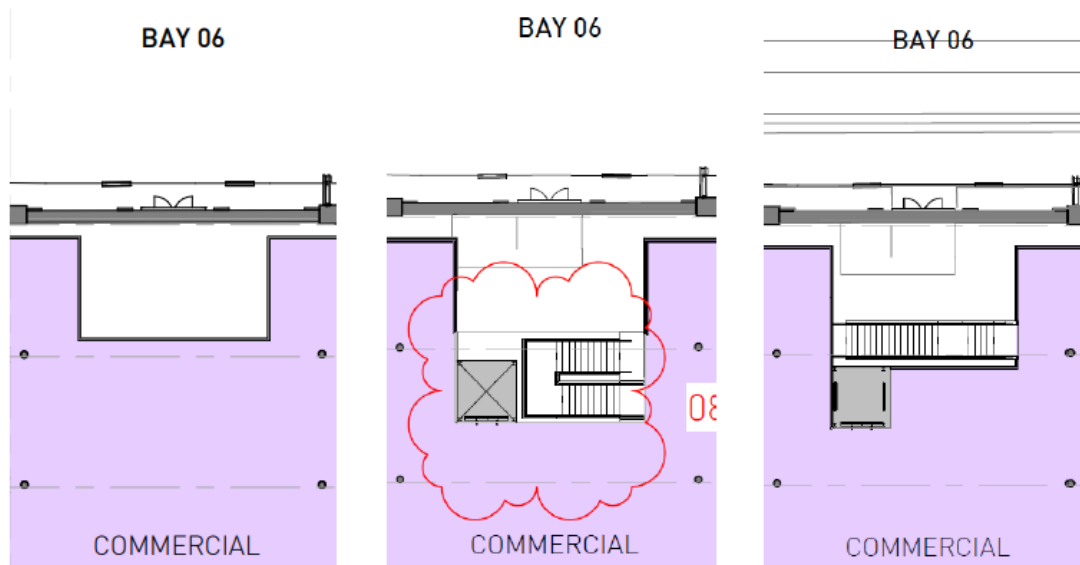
| Proposed slab extension (left: original approved SSD, centre: Mod 4 and right: proposal) (Source: Modification Report)
